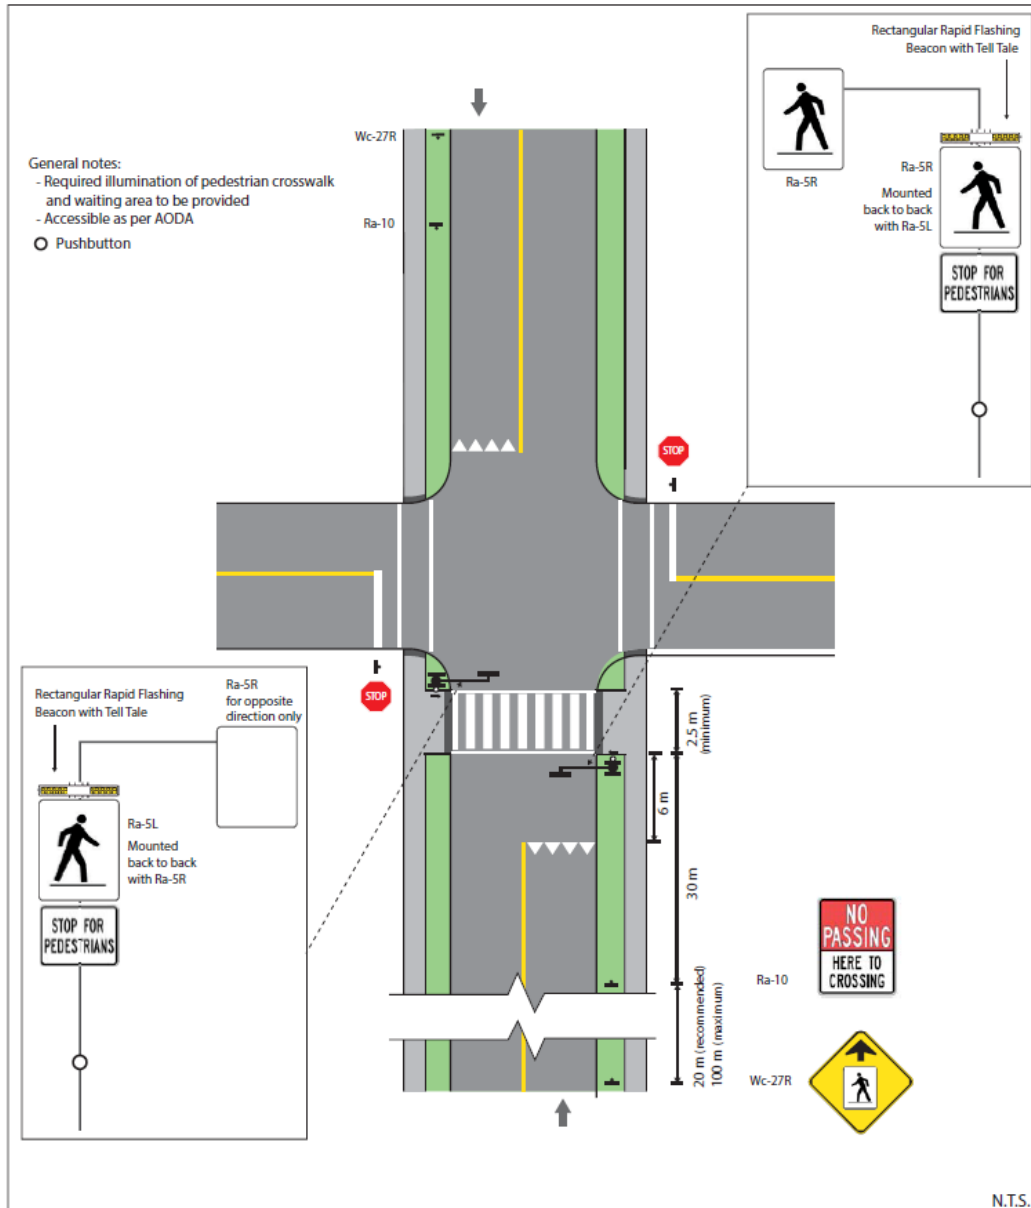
Level 2 Type B PXO Treatment at Intersection for 2-way Roadways (Source: OTM Book 15)
